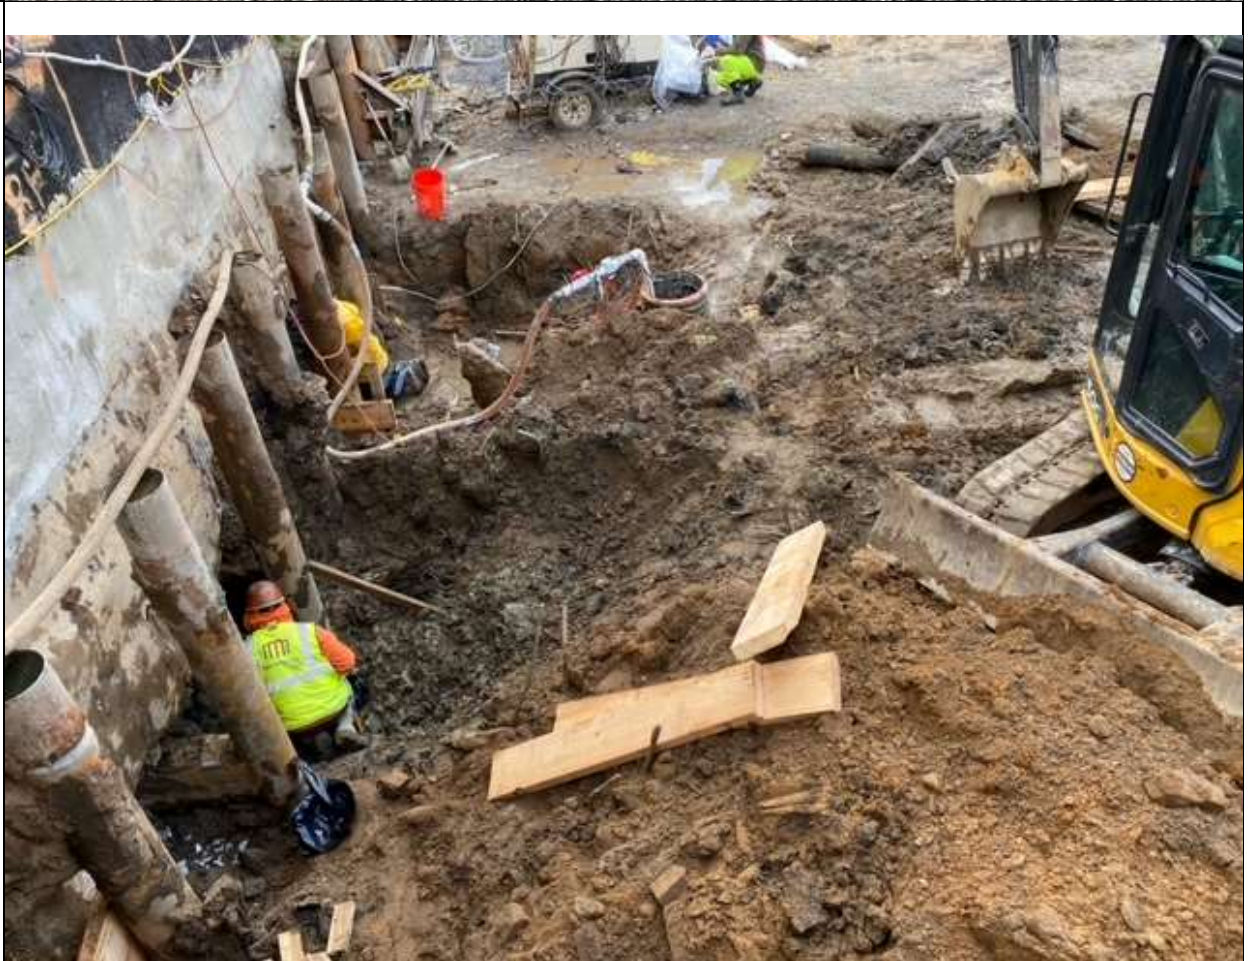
View of site towards the end of the day, facing towards Bayard Street
